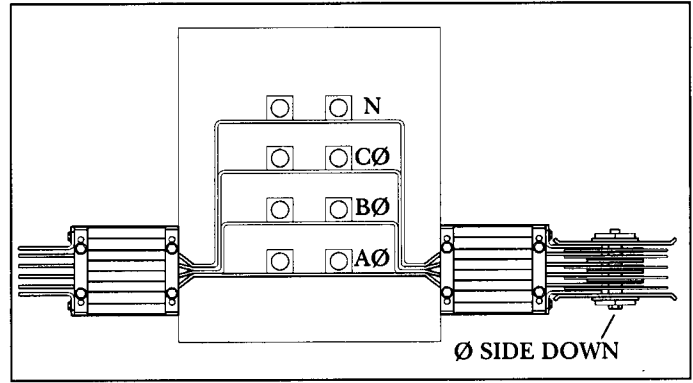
Inverted Center Tap Box Up Position, Side View
